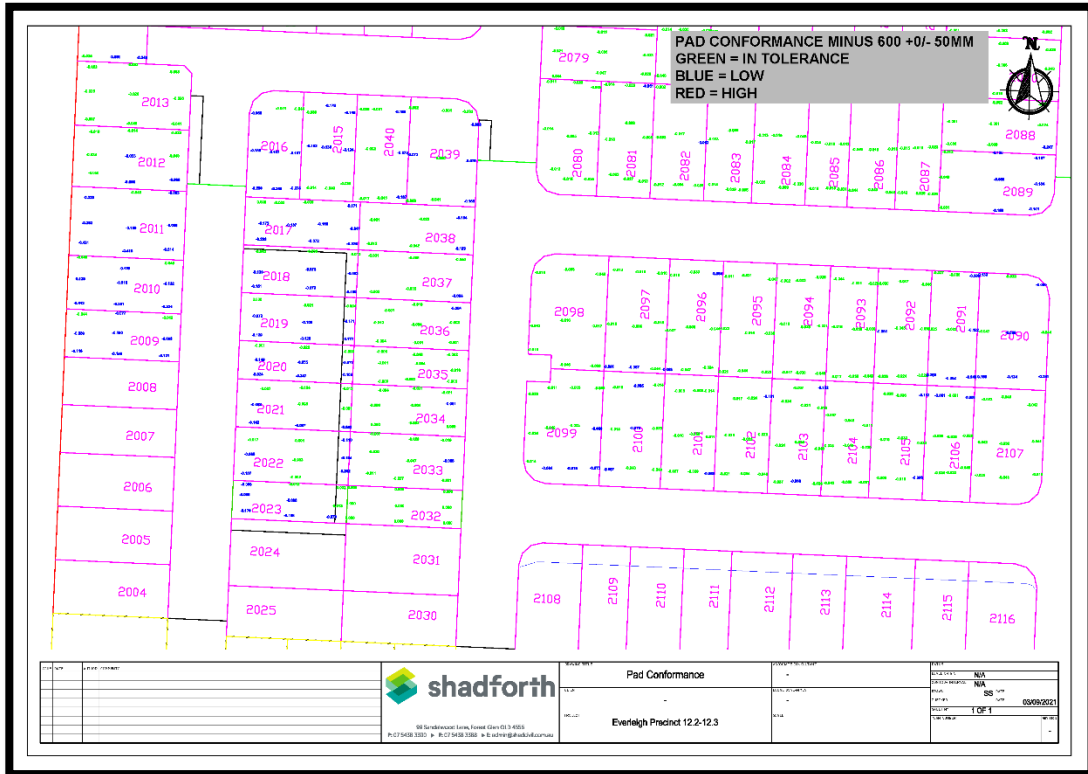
Actual Constructed Area of Fill – Shadforth Survey Plans
